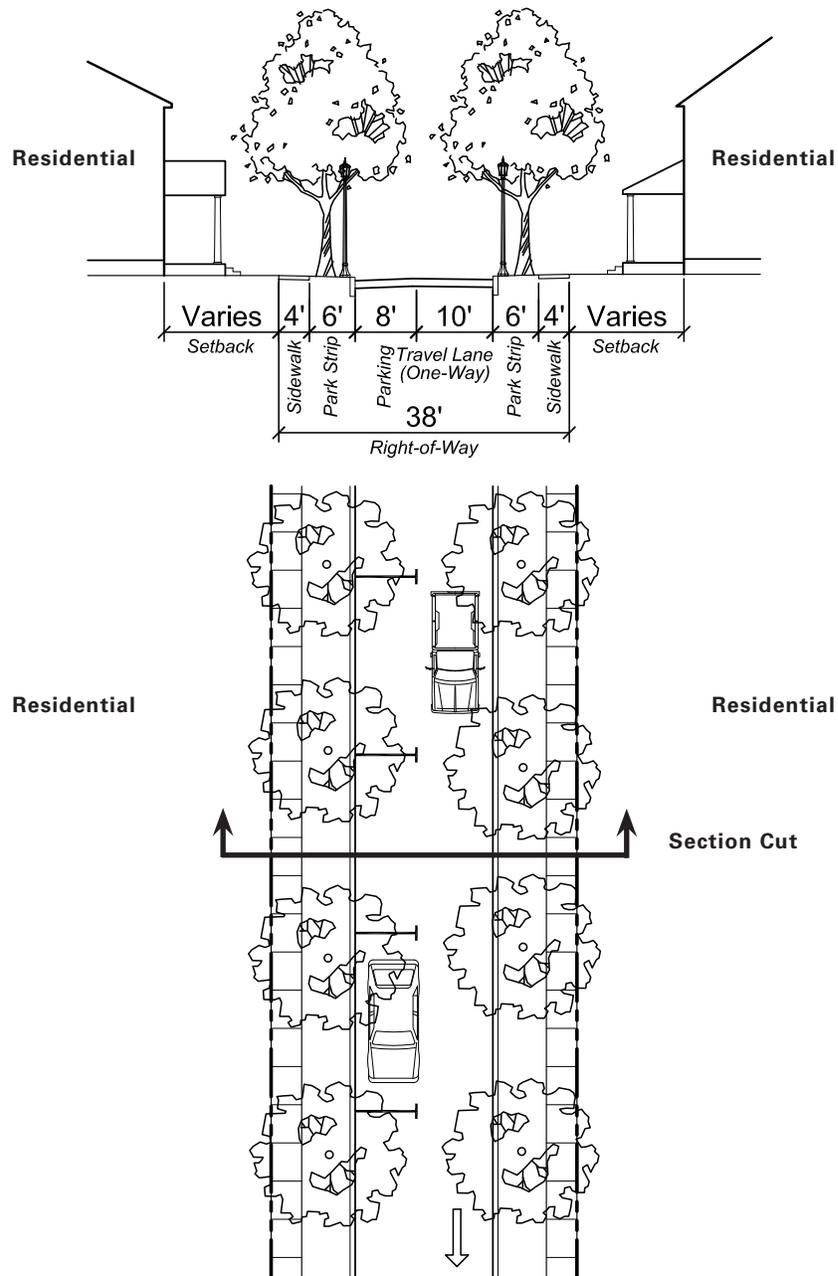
Proposed Section and Plan: One-Way Street Parking One Side
